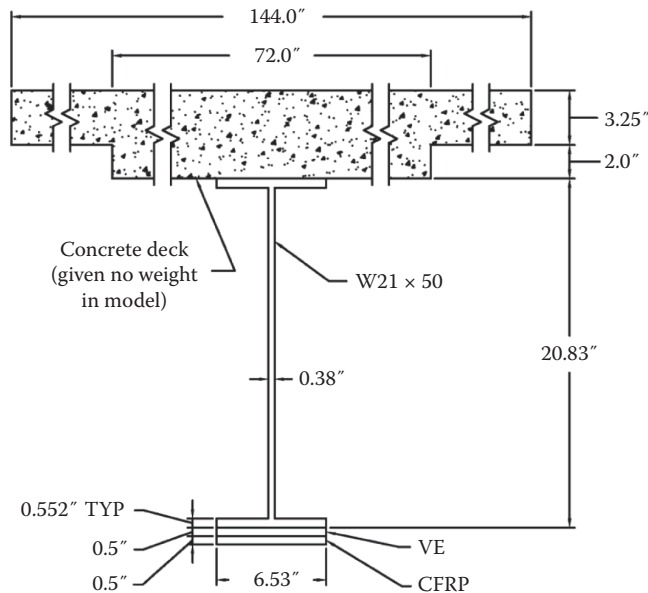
Dimensions of girder and slab as modeled (1 in. = 25.4 mm).
